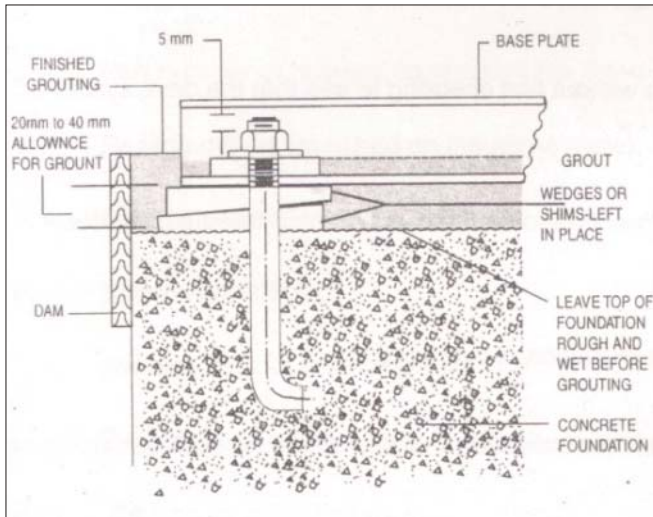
TYPICAL FOUNDATION BOLT DESIGN
